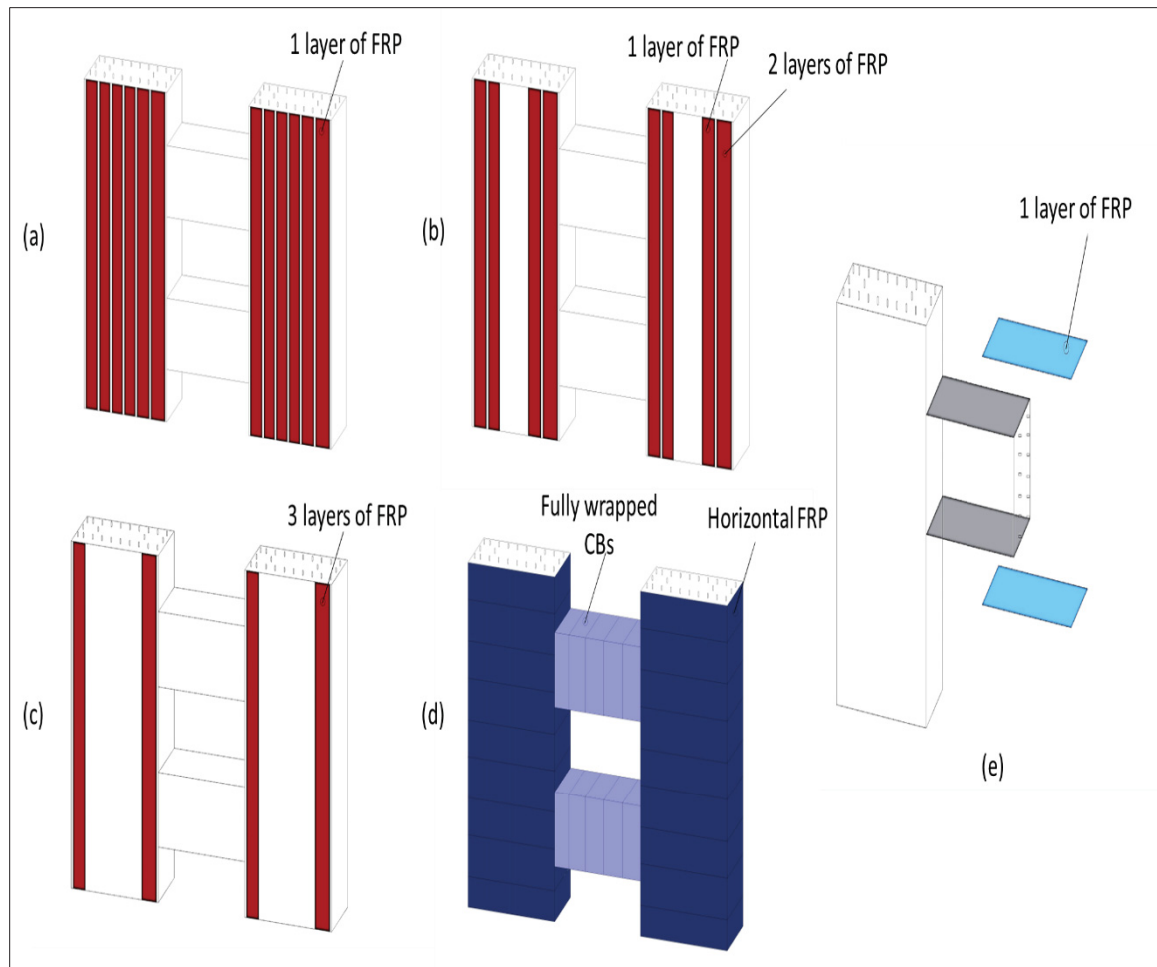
Strengthening schemes: (a) wall piers in S1-CSW; (b) wall piers in S2-CSW; (c) wall piers in S3-CSW; (d) FRP wrapping of wall piers and coupling beams in all schemes; and (e) coupling beams' flexural strengthening in S3-CSW
